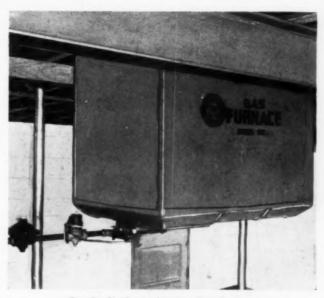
Single gas burning floor furnace, gravity type, shown from under the floor
